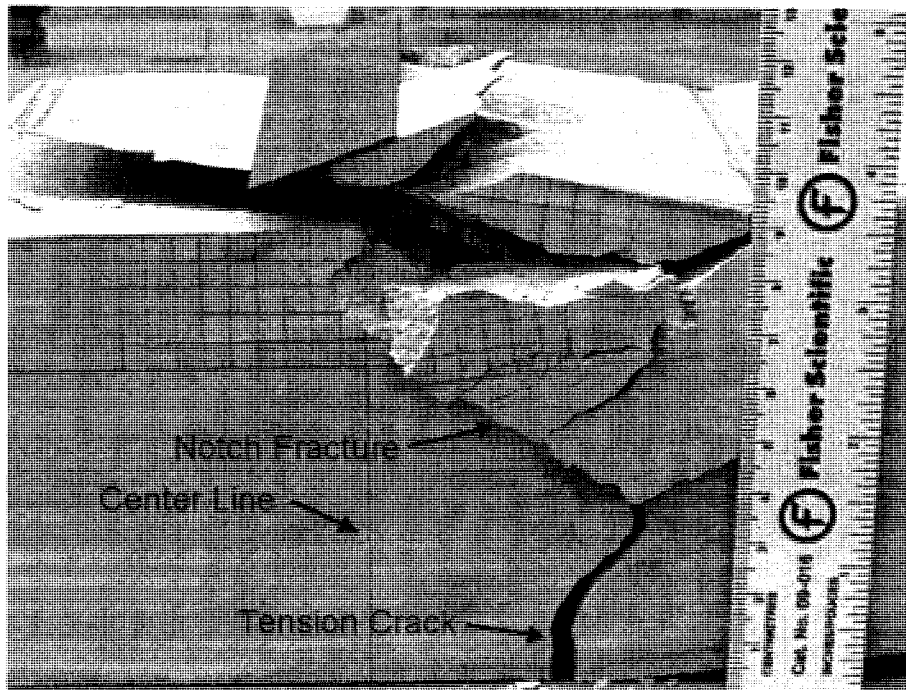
Final ruptured shape of beam specimen and spalled shard inside the specimen at top center.
